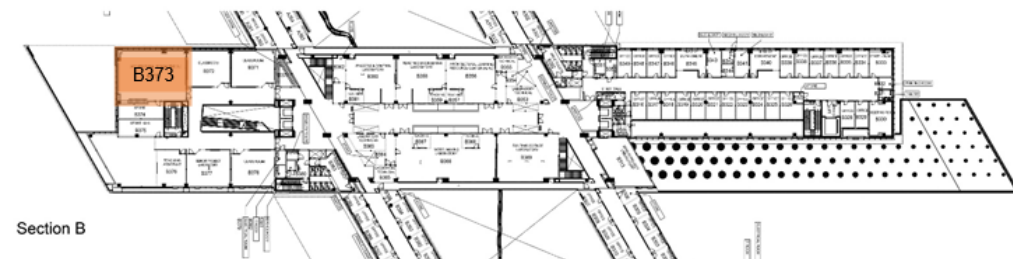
Second floorplan of Section B, H07 – architectural design studios (not to scale)
